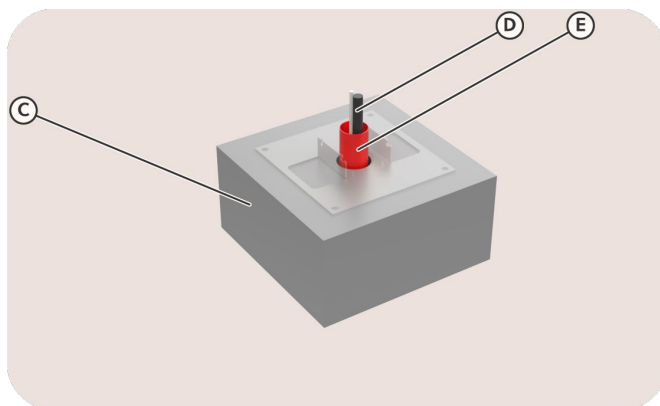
Example of a solid foundation (C), with cables (D) in a flexible conduit system (E)
